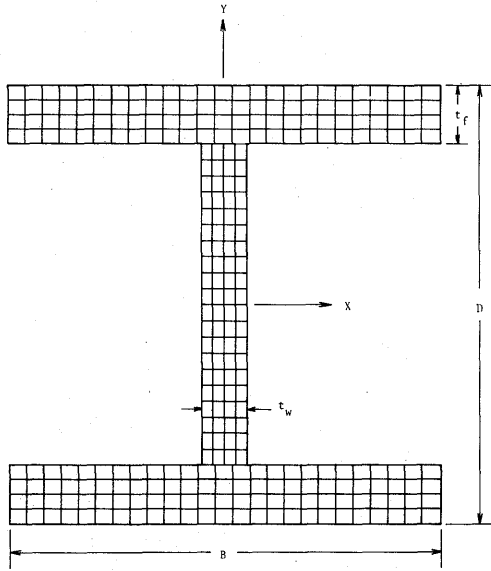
Wide-Flange Section Divided into Finite Elements.
